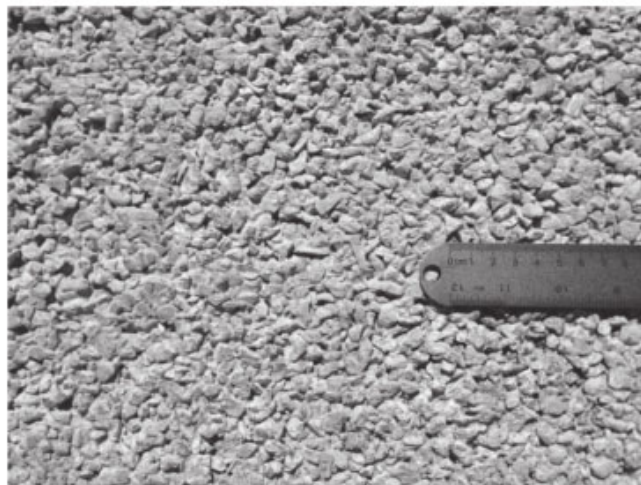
Pervious concrete pavement (photo courtesy of M. Offenberger).
